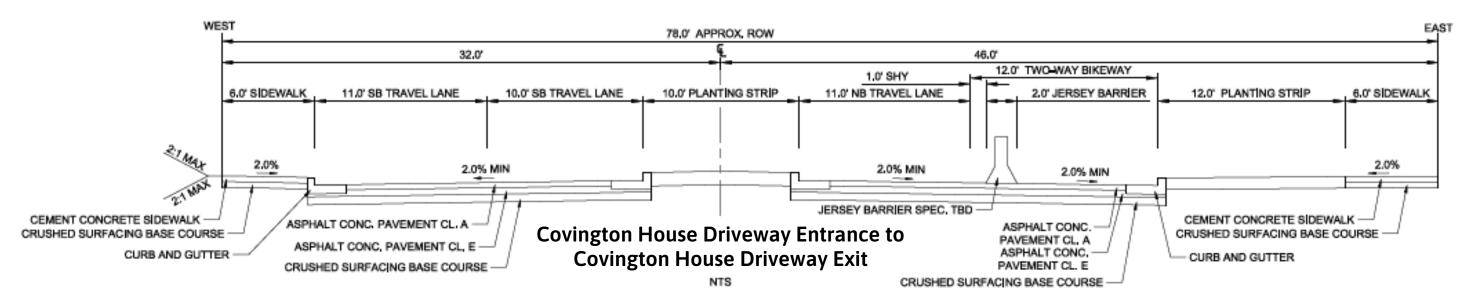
Cross section detail for Main Street between Covington House Driveway Entrance to Covington House Driveway Exit
